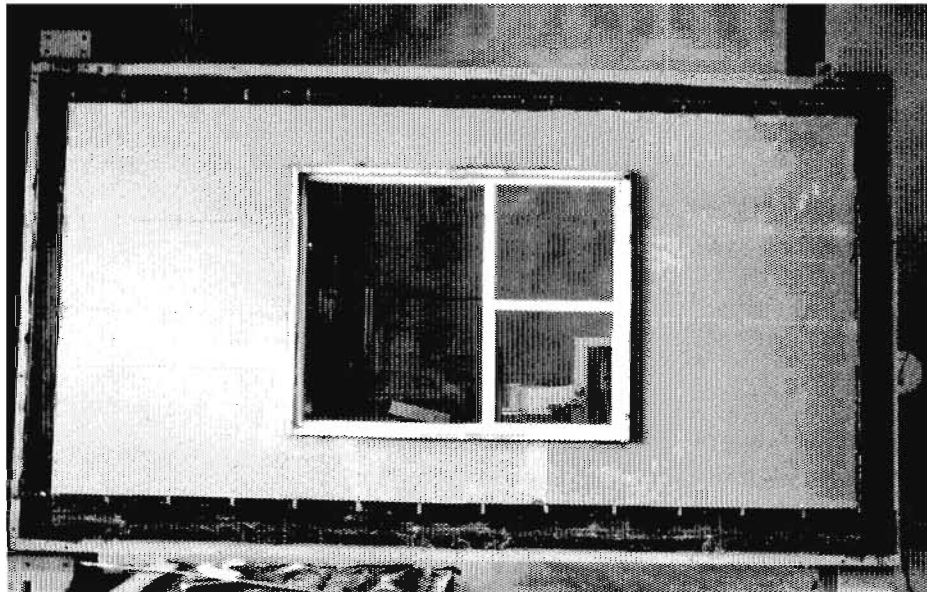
PLACEMENT OF WINDOW WITHIN BACKUP WALL
